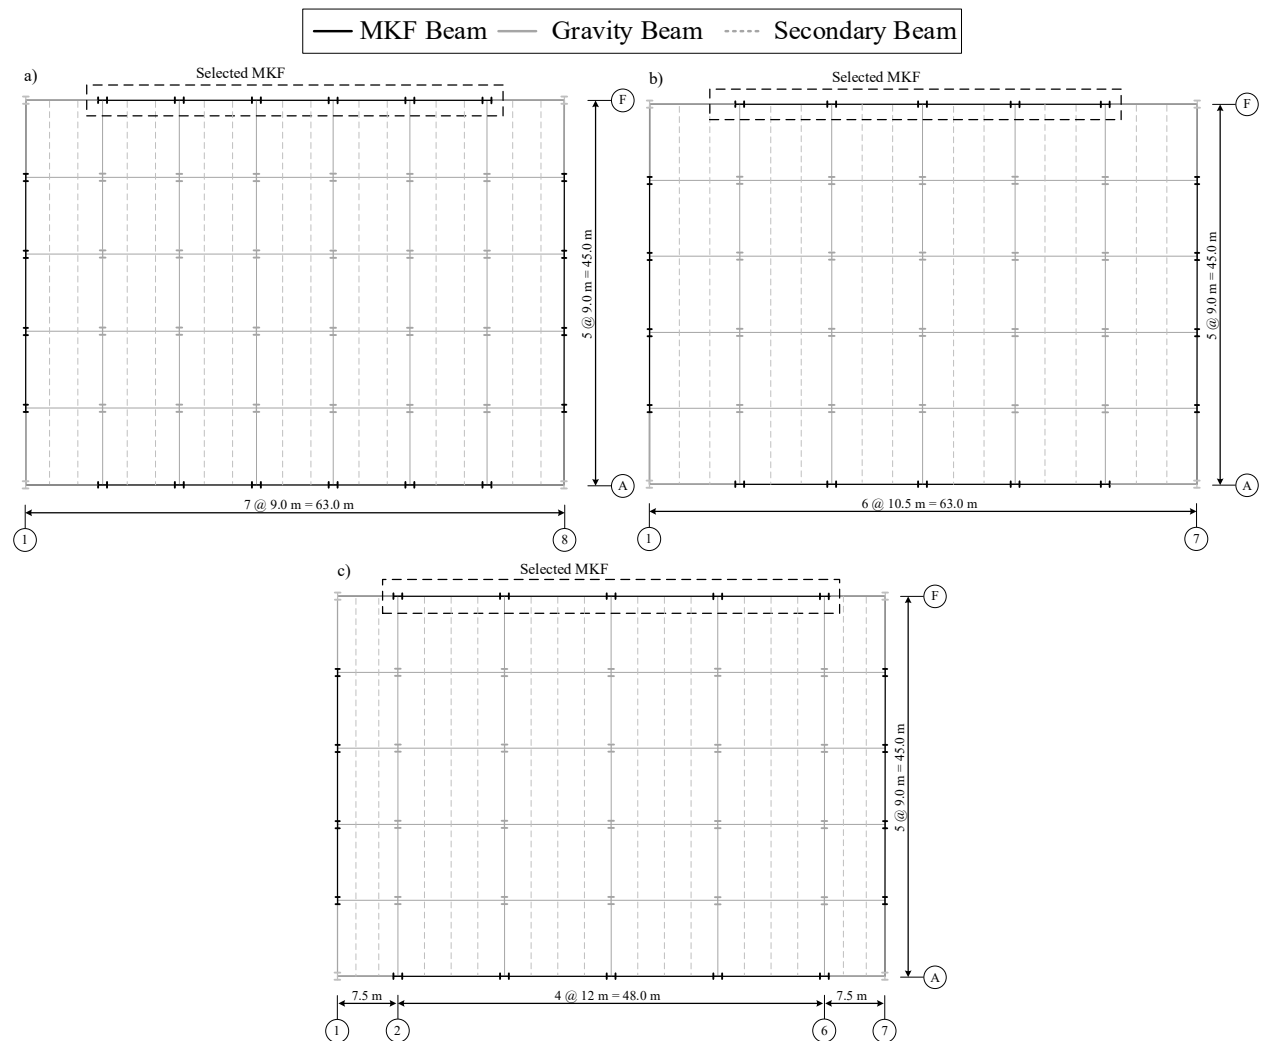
Plan view of the selected building: a) 9.0 m long MKF span (Layout 1); b) 10.5 m long MKF span (Layout 2); c) 12.0 m long MKF span (Layout 3).
